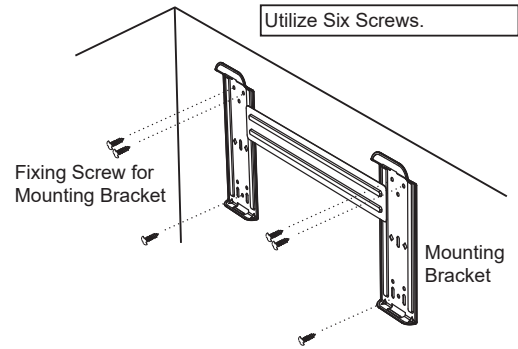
Mounting on Concrete Wall or Concrete Block Wall
